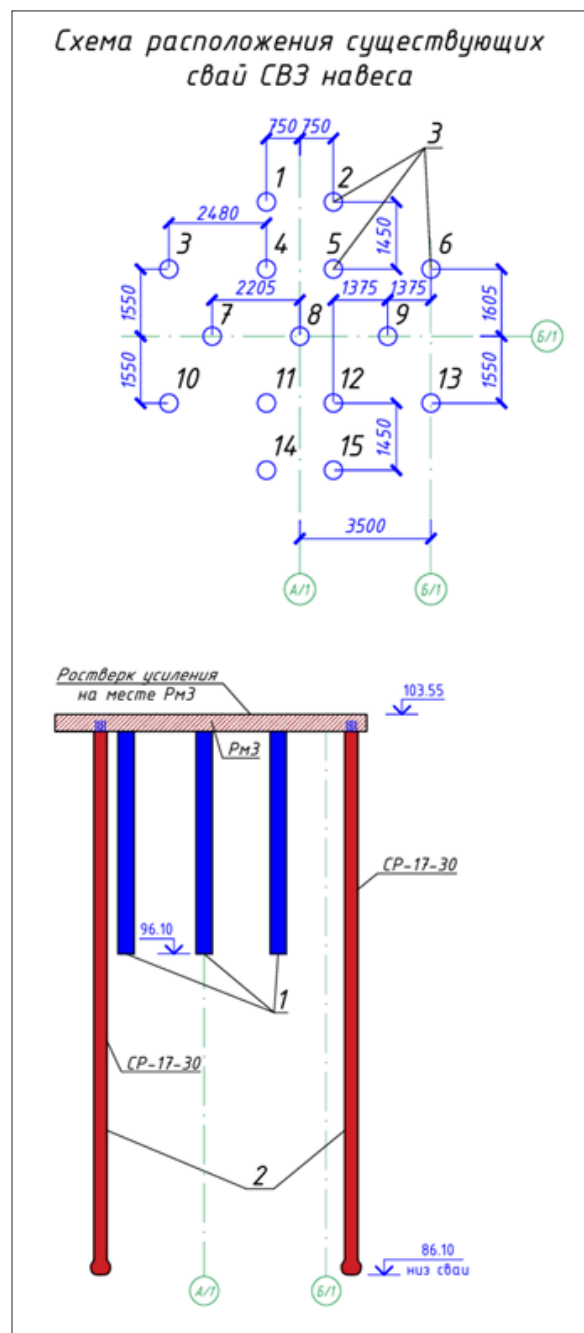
Scheme of reinforcement of the foundation base of the canopy: 1 - existing driven piles; 2 - bored piles ERT
